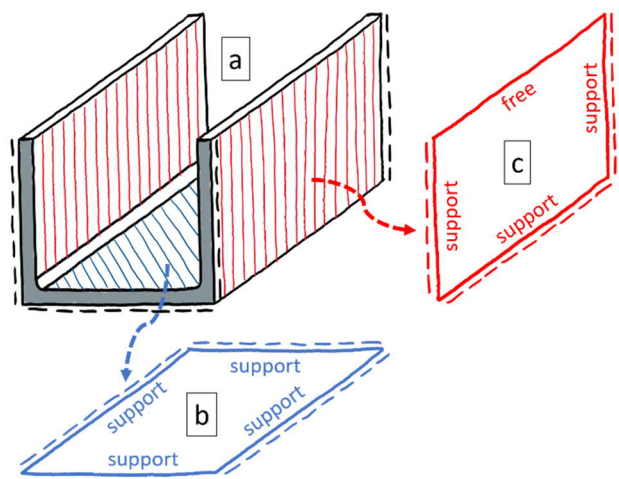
Decomposition of the thin-walled member with stiffened ends: a) original member, b) internal wall, c) outstand wall.
